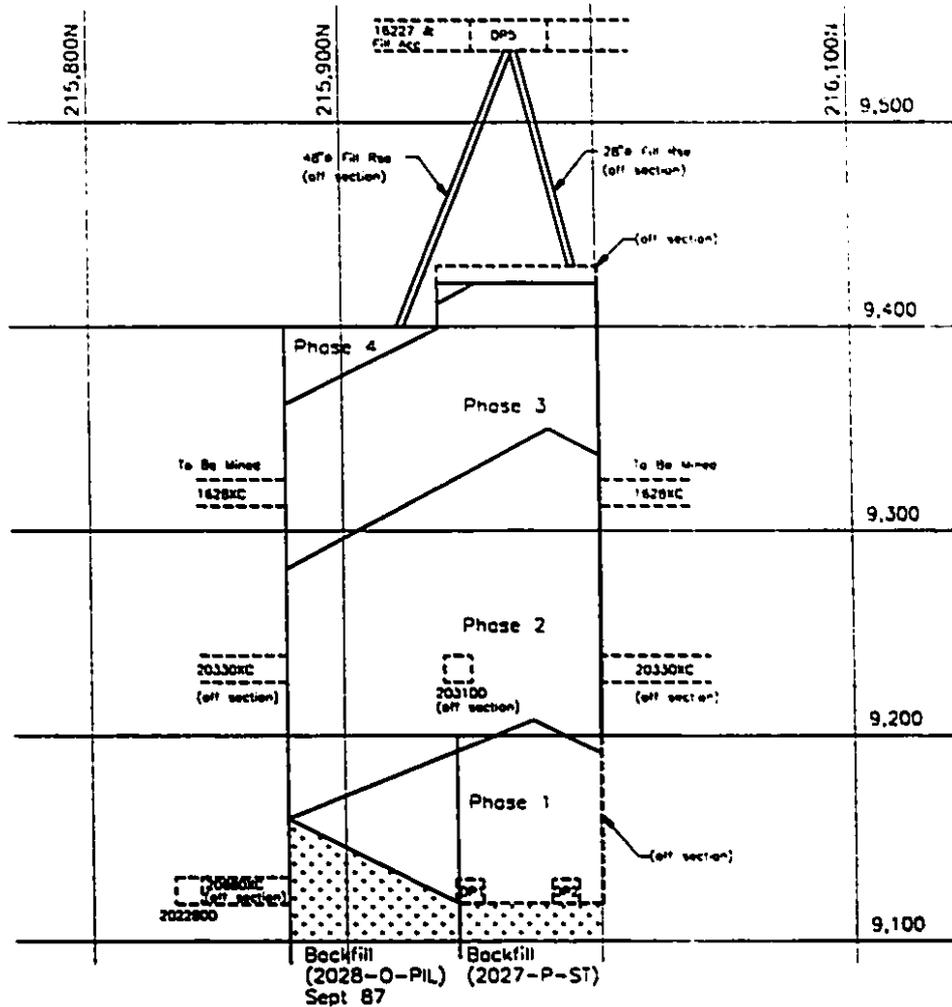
Section C-C Looking North Through 214.150N
